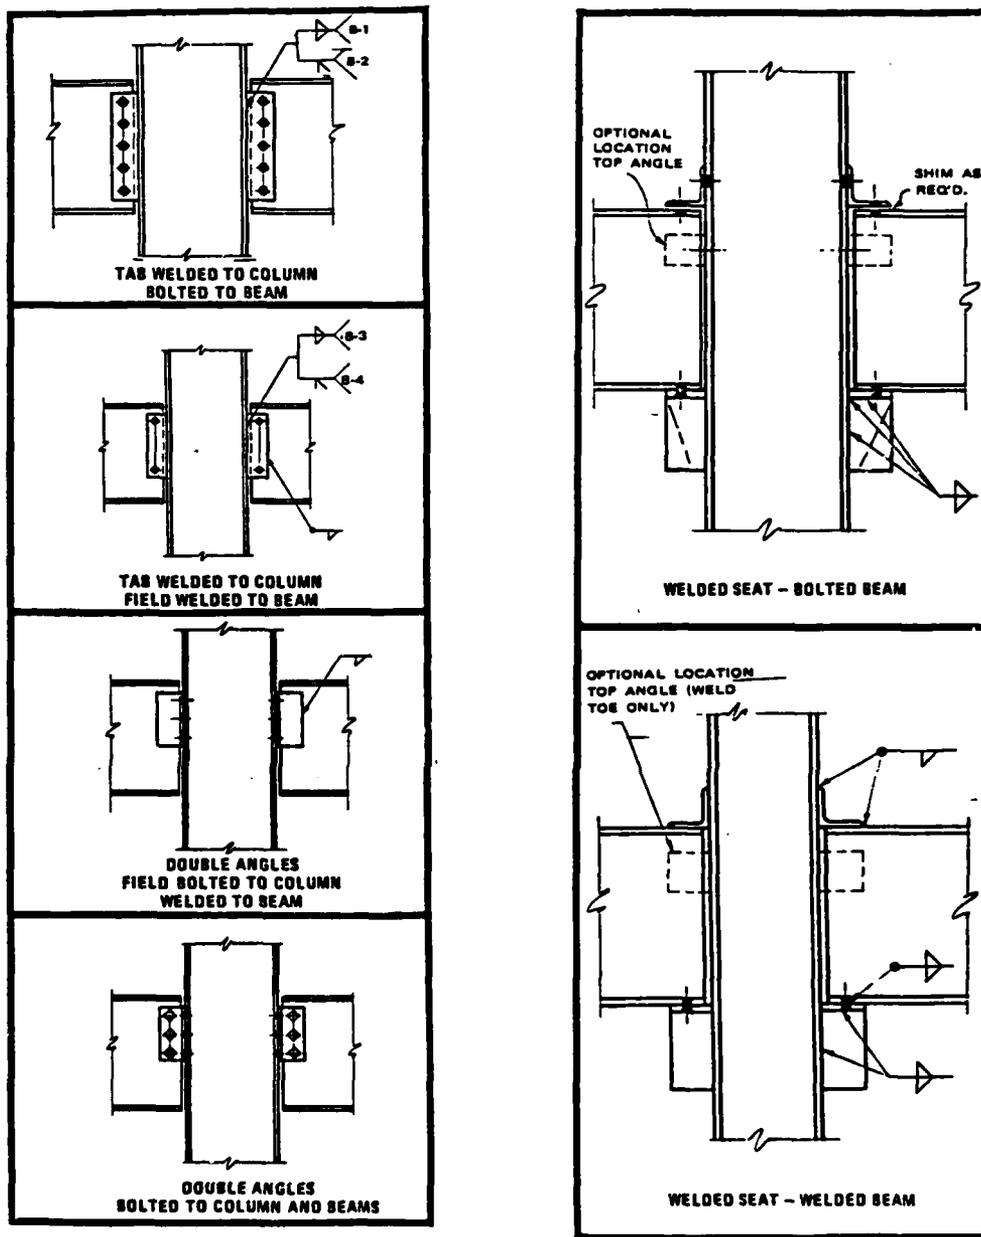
Shear Connections - Beam to Column. (Ref. 24)
